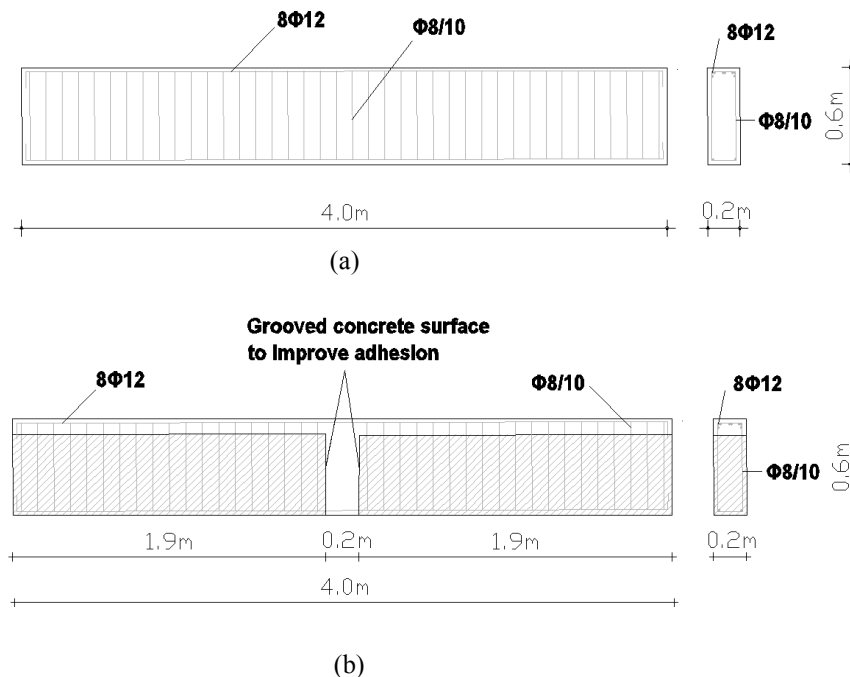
(a) Single beam reinforcement of the second group of specimens. (b) Composite beam reinforcement of the second group of specimens.
